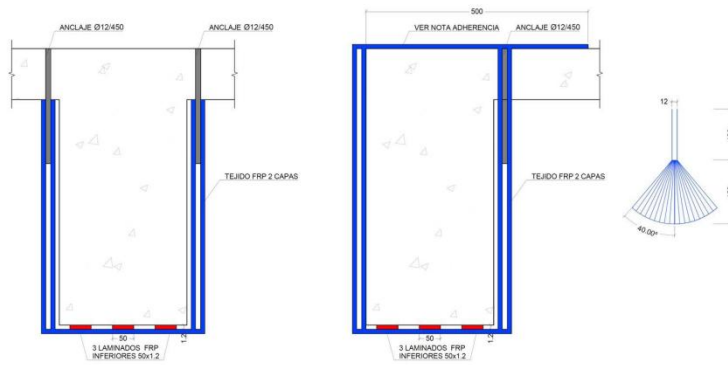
Detail of the anchoring of FRP shear reinforcement fabrics in interior and edge beams
